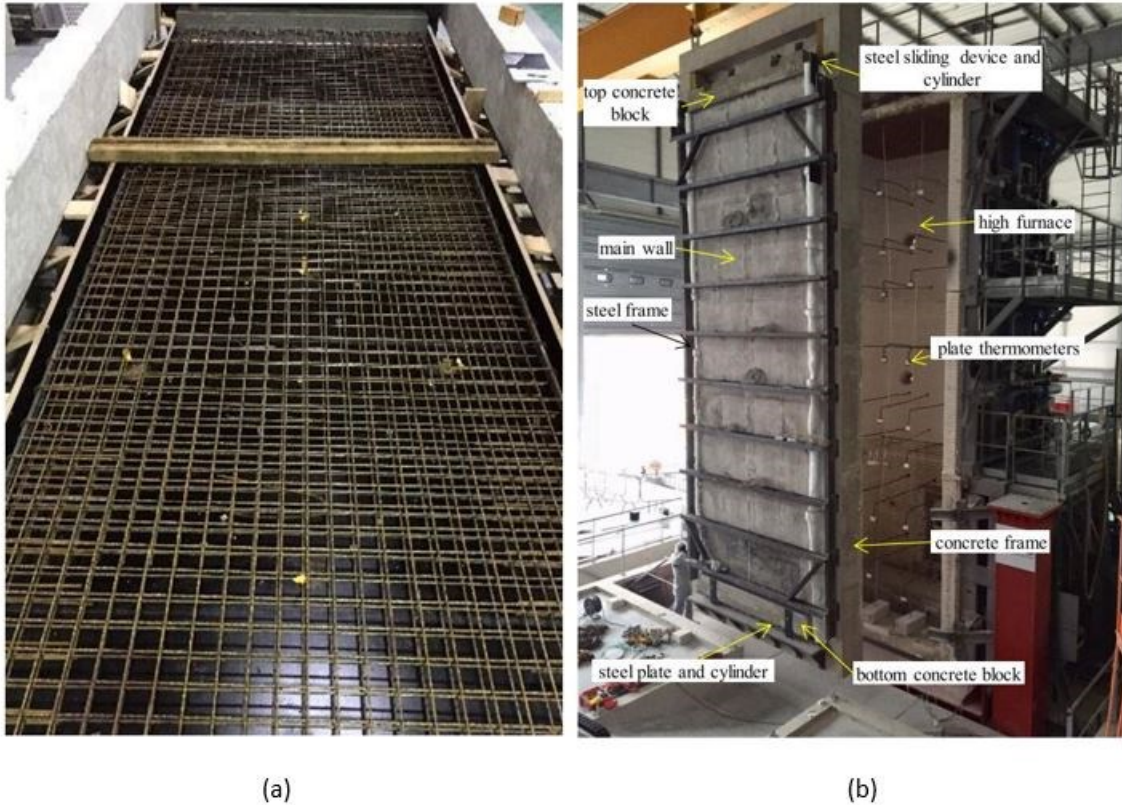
Details of the test RC wall (a. rebar layout, b. test setup)
